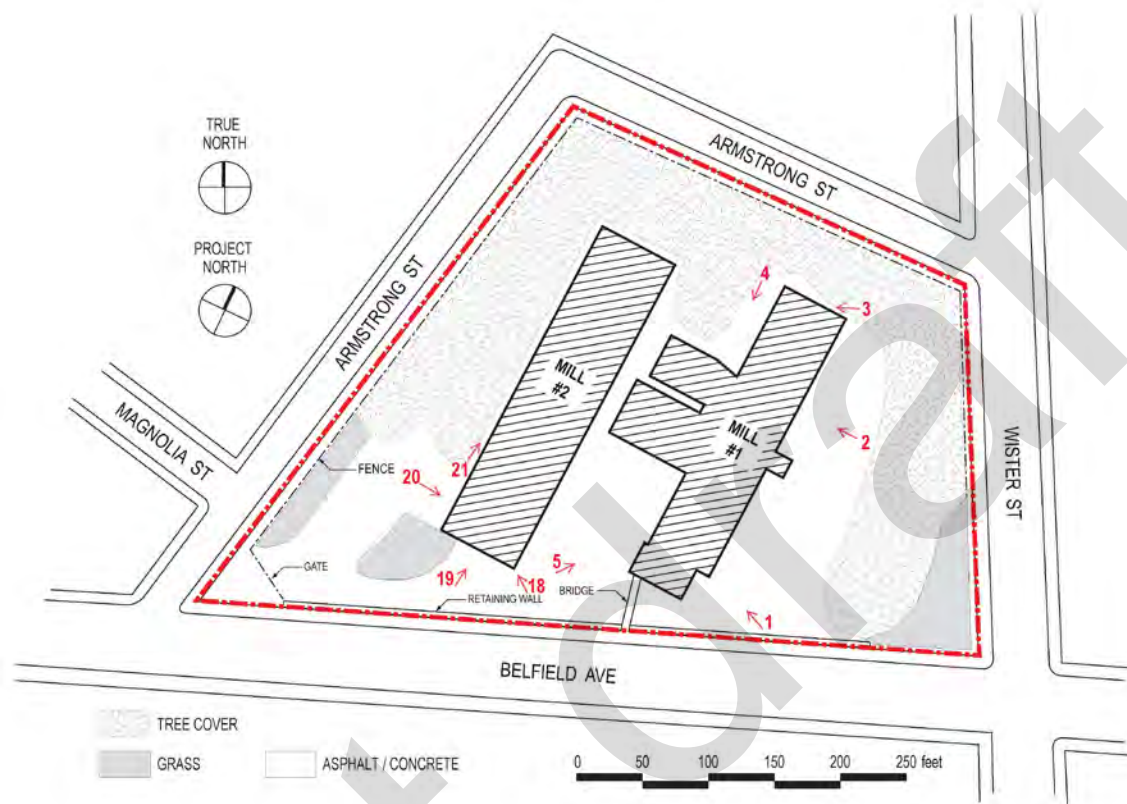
Site Plan with NRN Boundary and Exterior Photo Key
